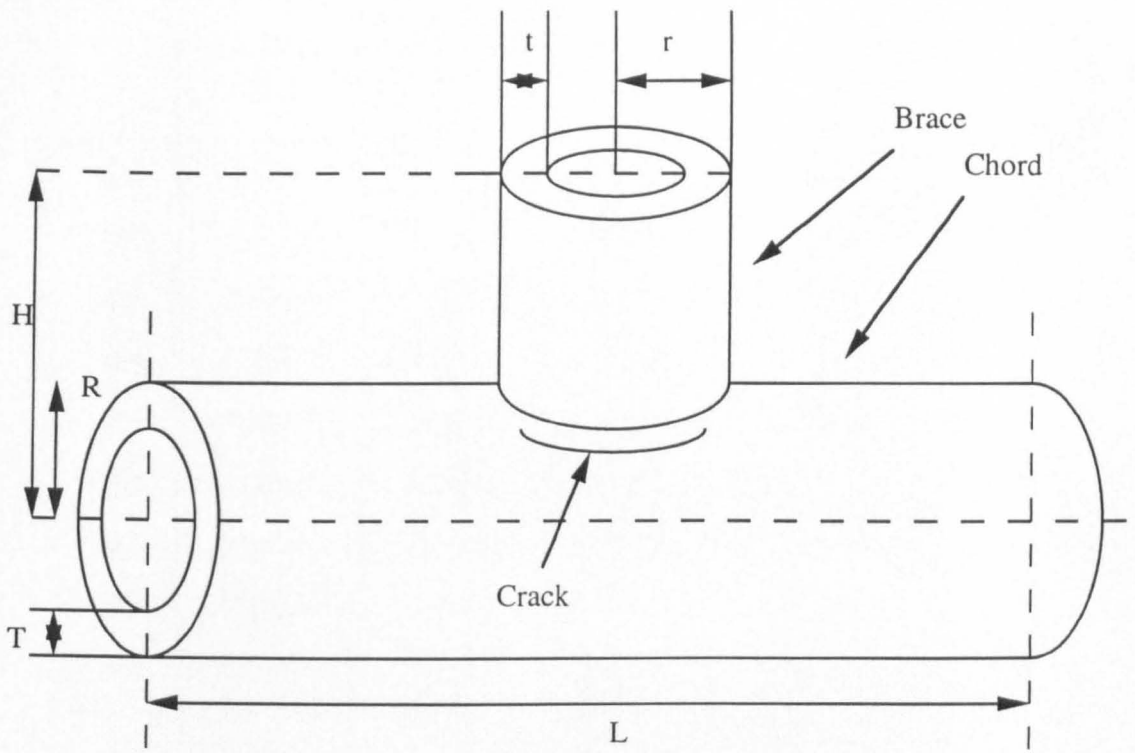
Schematic of Tubular Welded Joint Geometry
